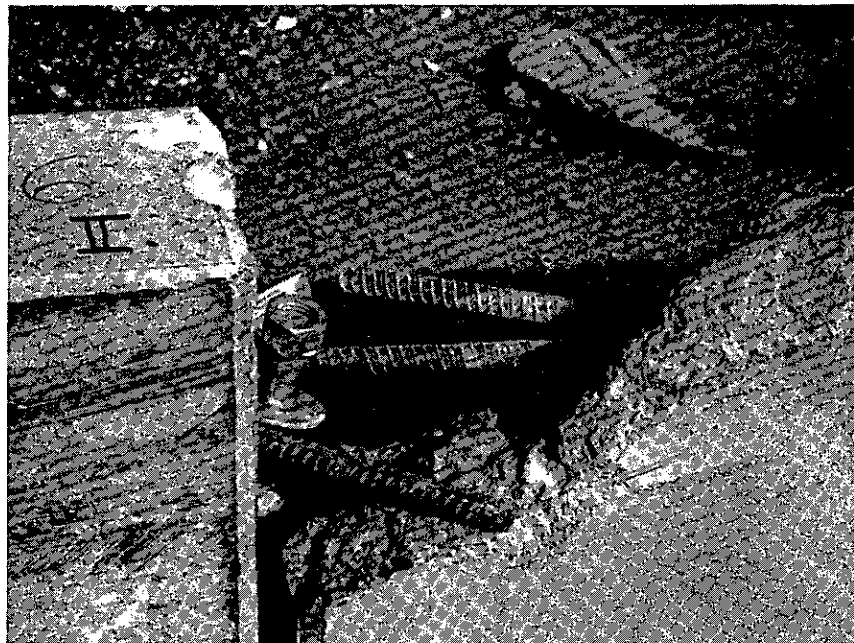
, Top Hinge Rebar Pull-Out Failure (view of impact side of barrier), First Joint Downstream from Impact, Test 292
